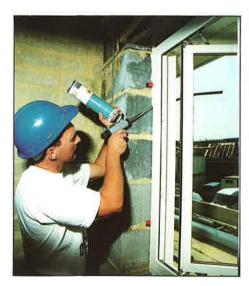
DETAILING AROUND FACTORY-FINISHED COMPONENTS
